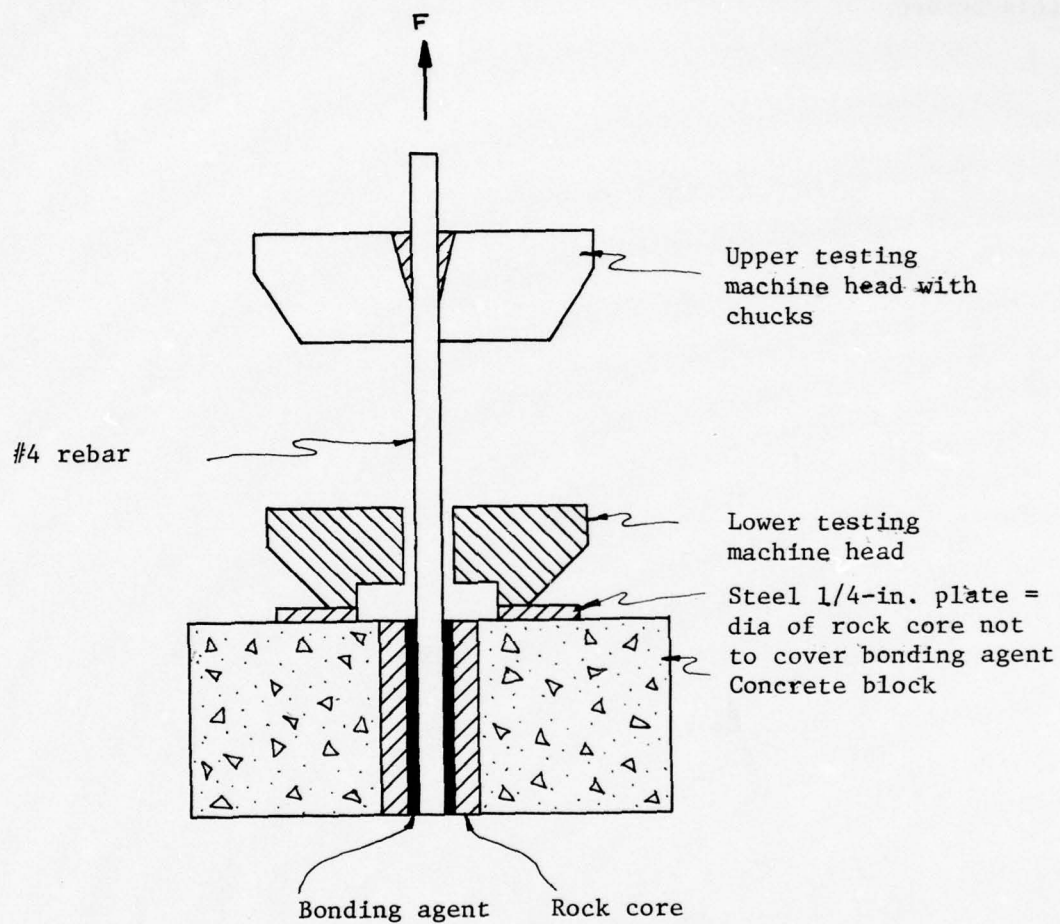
Section showing test configuration for the reinforcing bar pullout tests.
